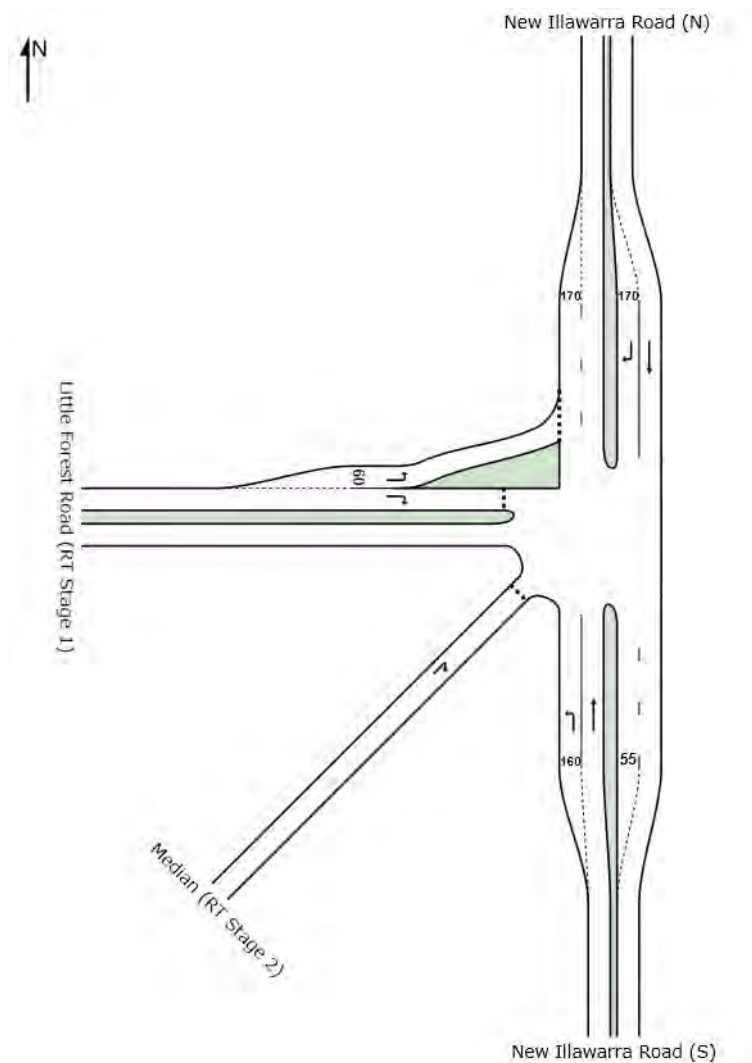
Existing Little Forest Road/New Illawarra Road intersection layout
